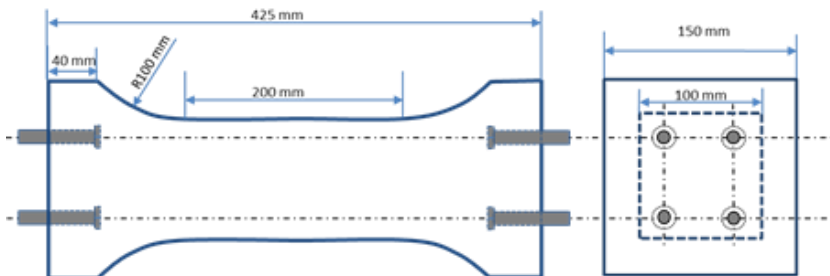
Shape and dimensions of dumbbell specimen for tests under tension.
